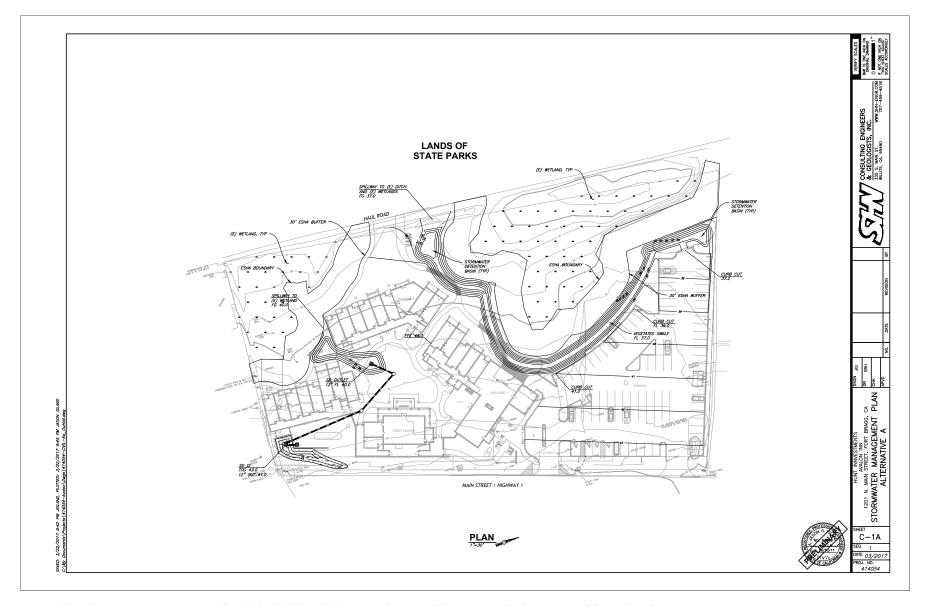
SHN Stormwater Management Plan, 2017.03, Sheet C-1A, on-site drainage [Alternative B for the purpose of this analysis].
